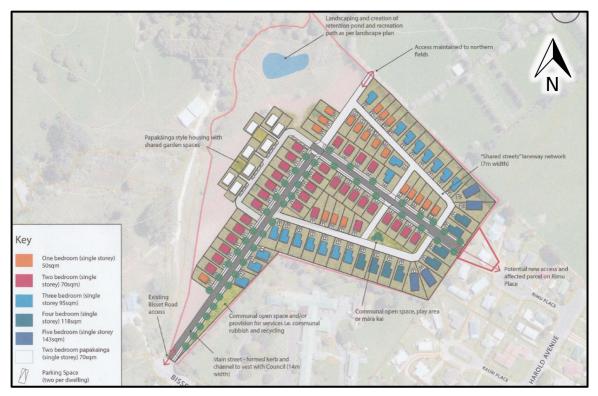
Proposed Development (Source: Site Plan by Kainga Ora)
